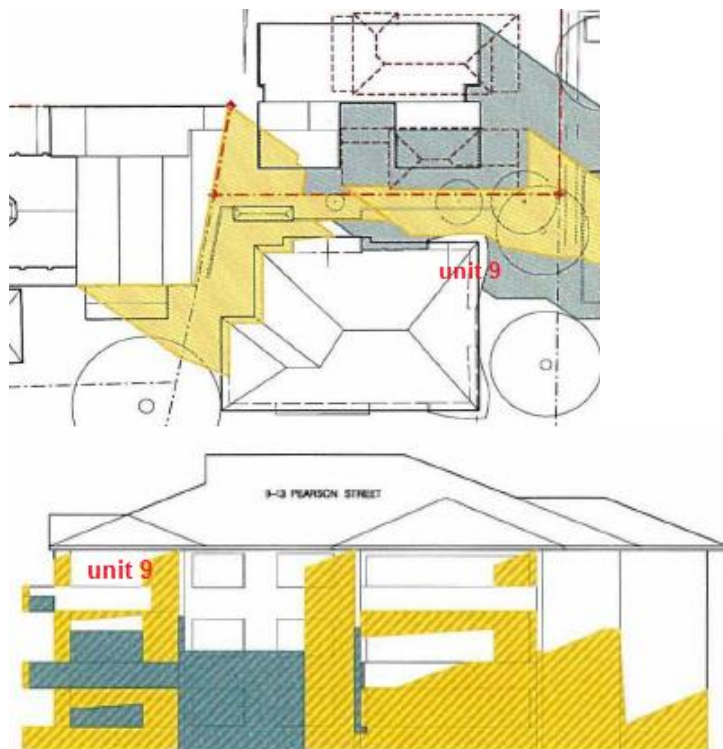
Plan and elevation shadow diagrams at 3pm – the length of the shadow does not hit the 3rd floor
